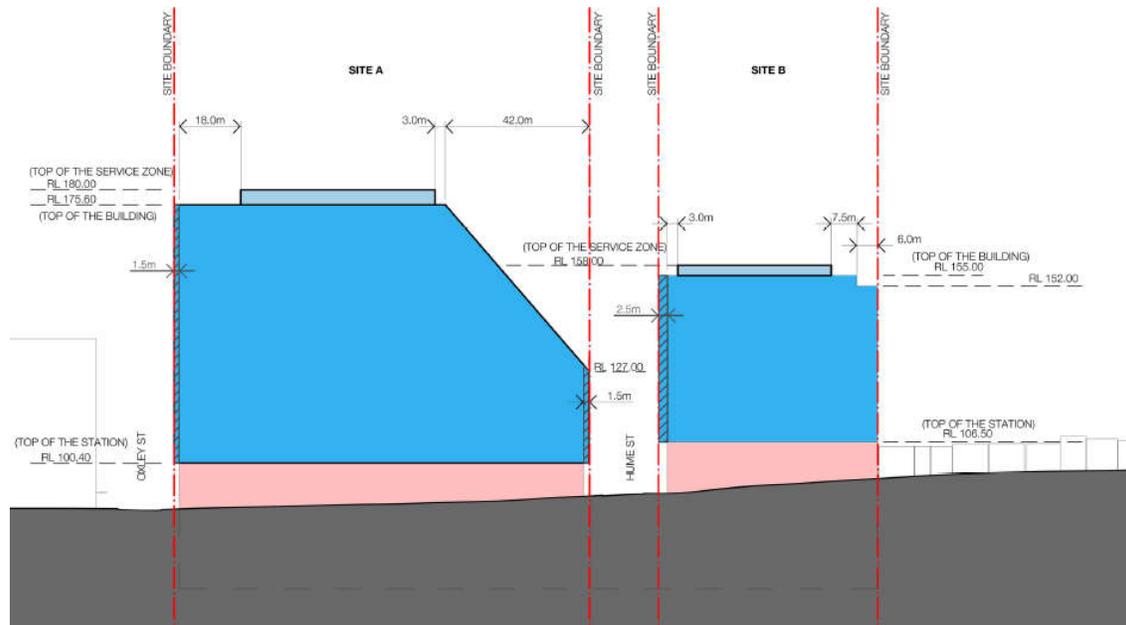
West elevation of the building envelope under the Amended Scheme, showing CSSI Approval (pink) and OSD components (blue)
